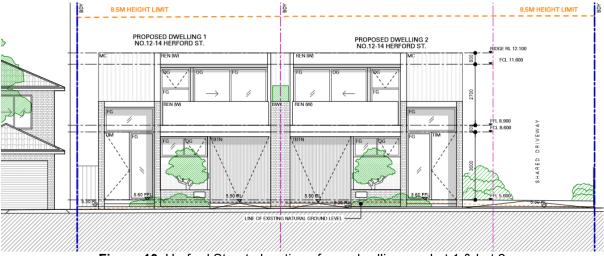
Herford Street elevation of new dwellings on Lot 1 & Lot 2
